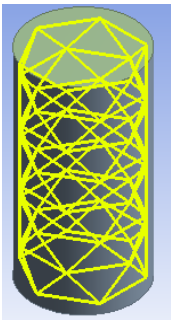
GFRP- hexagonal isotruss confined concrete column
